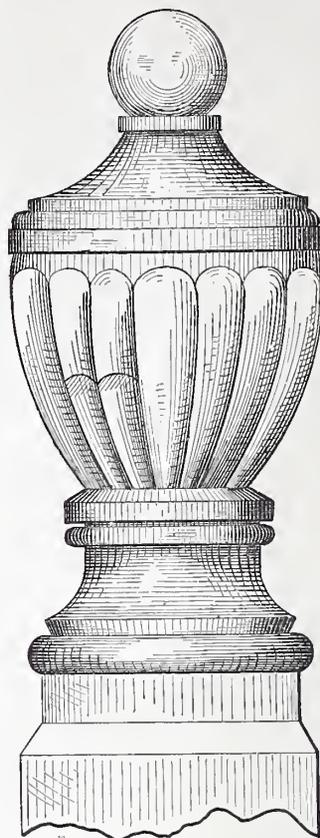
Detail of Top Ornament of Newel Post, Front Stairs.—Scale, 3 Inches to the Foot.
